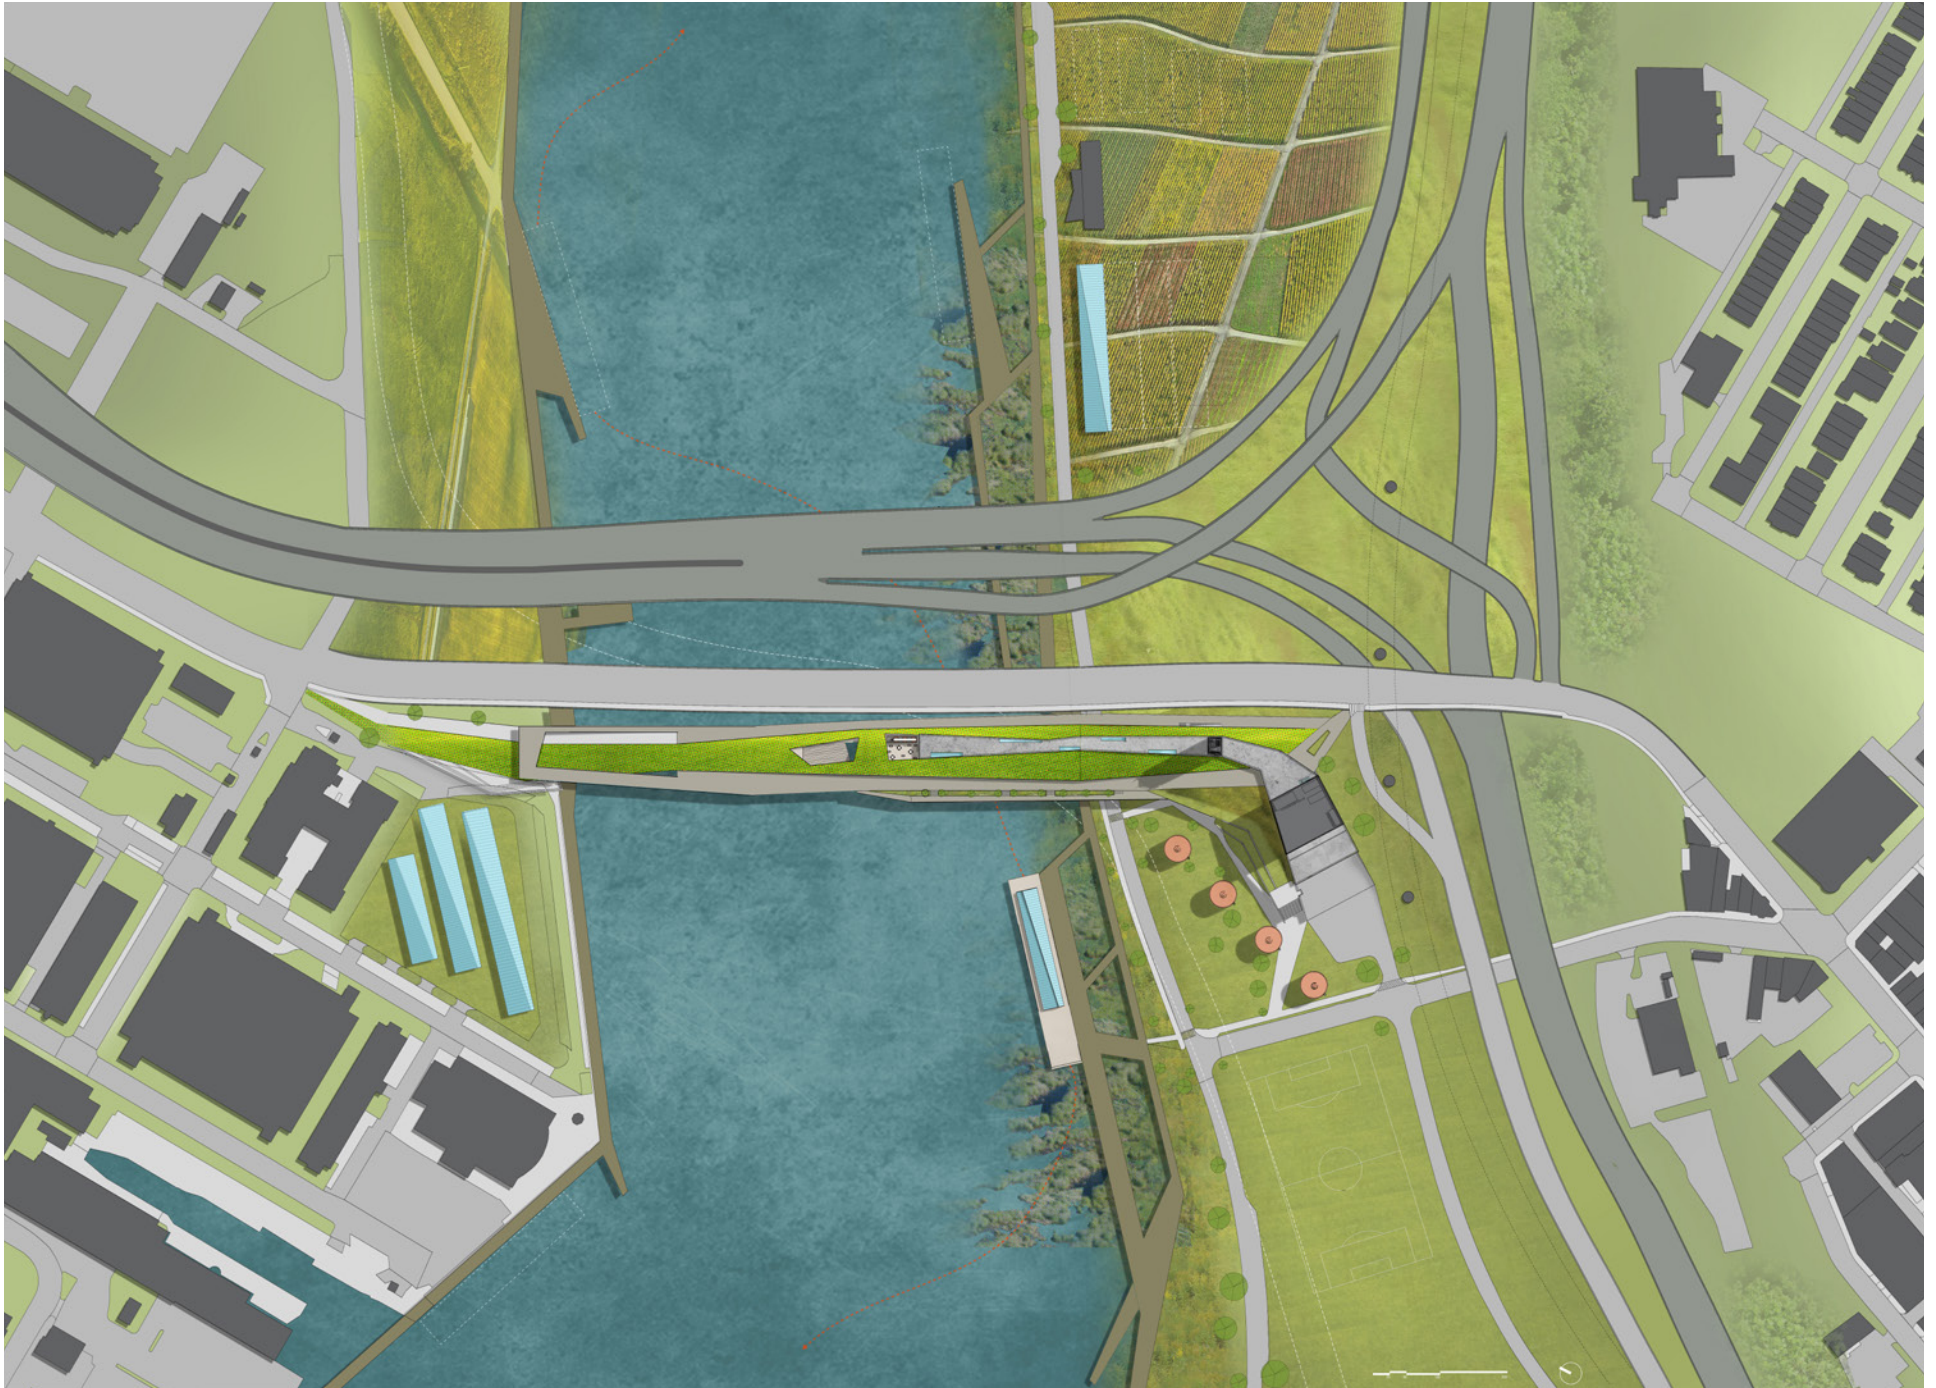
Site Plan showing landscape ribbon as connecting element. Greenhouses occupy the landscape with the ability to expand or contract as needed.
